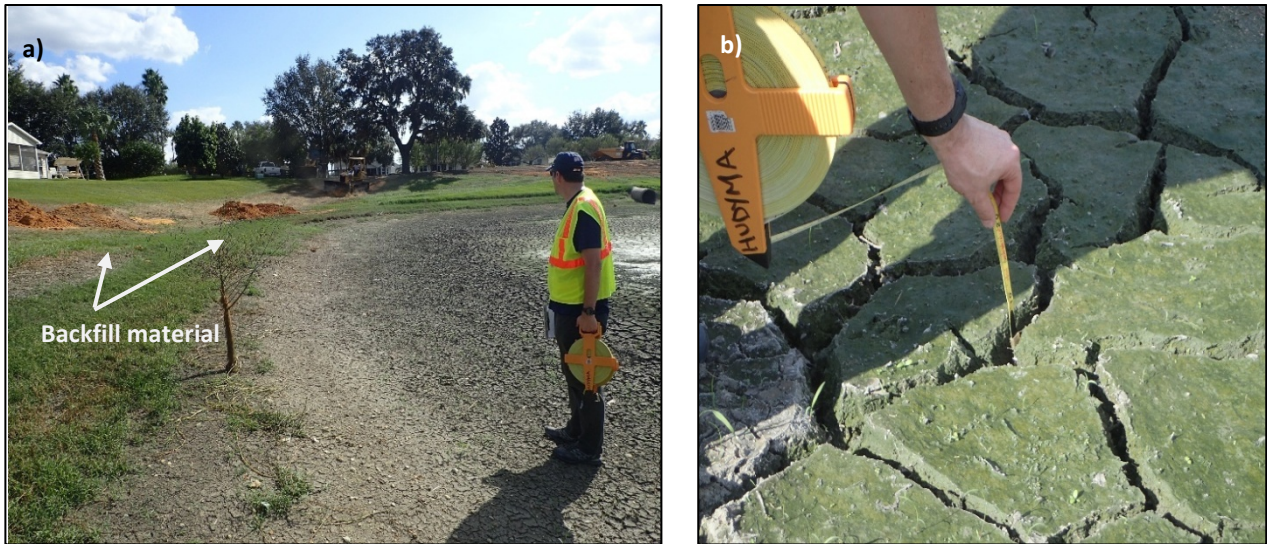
Retention pond between Alhambra Way and Botello Ave. (a) fully drained retention pond with fill material placed on the bank for backfilling sinkholes (Latitude 29°57'9.18"N / Longitude 81°59'31.5"W), and (b) 10 mm deep desiccation cracks in the pond bottom (Latitude 28°57'10.94"N / Longitude 81°59'36.67"W).
